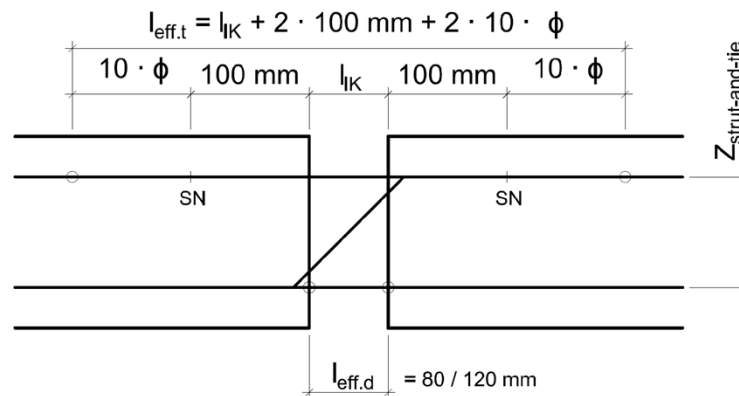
$l_{eff}$  for tension bars made of stainless steel round bars in the joint and concrete compression elements (CCE)
